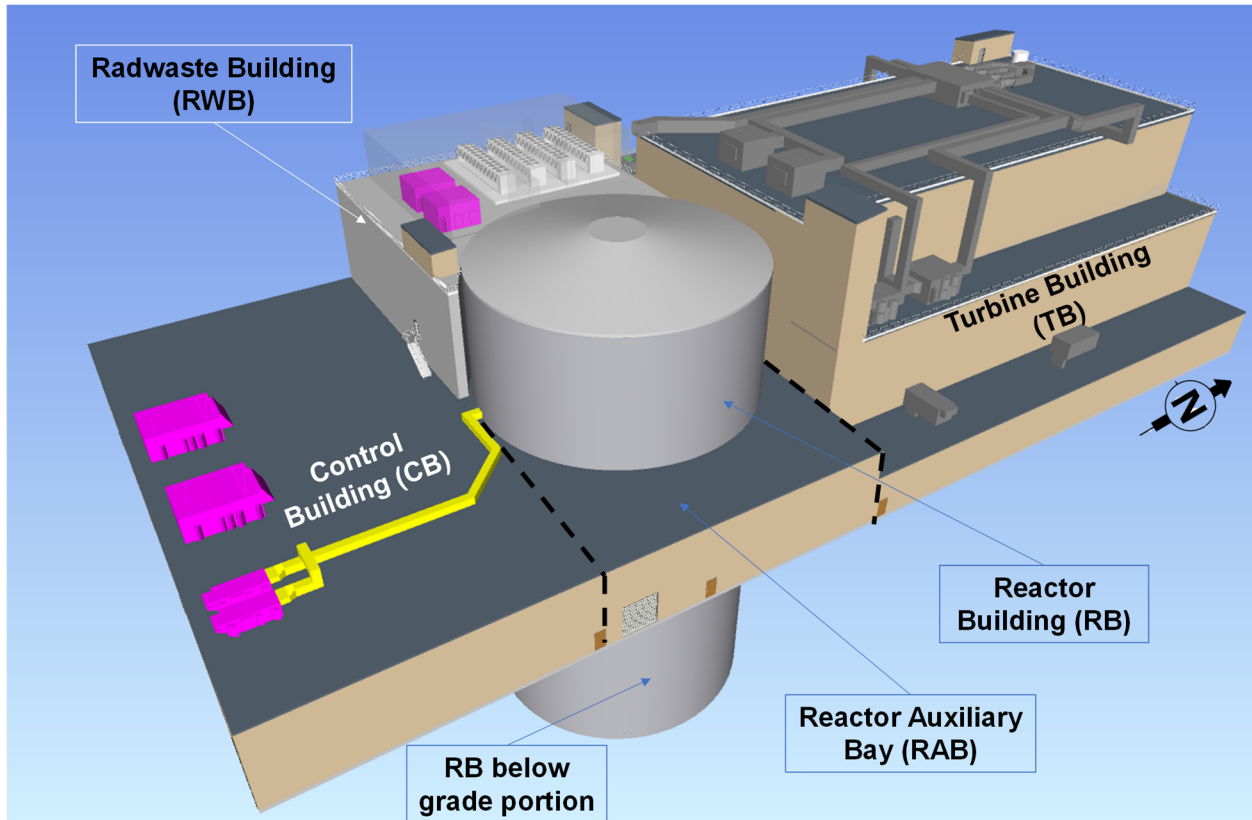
BWRX-300 Power Block Three-Dimensional View
